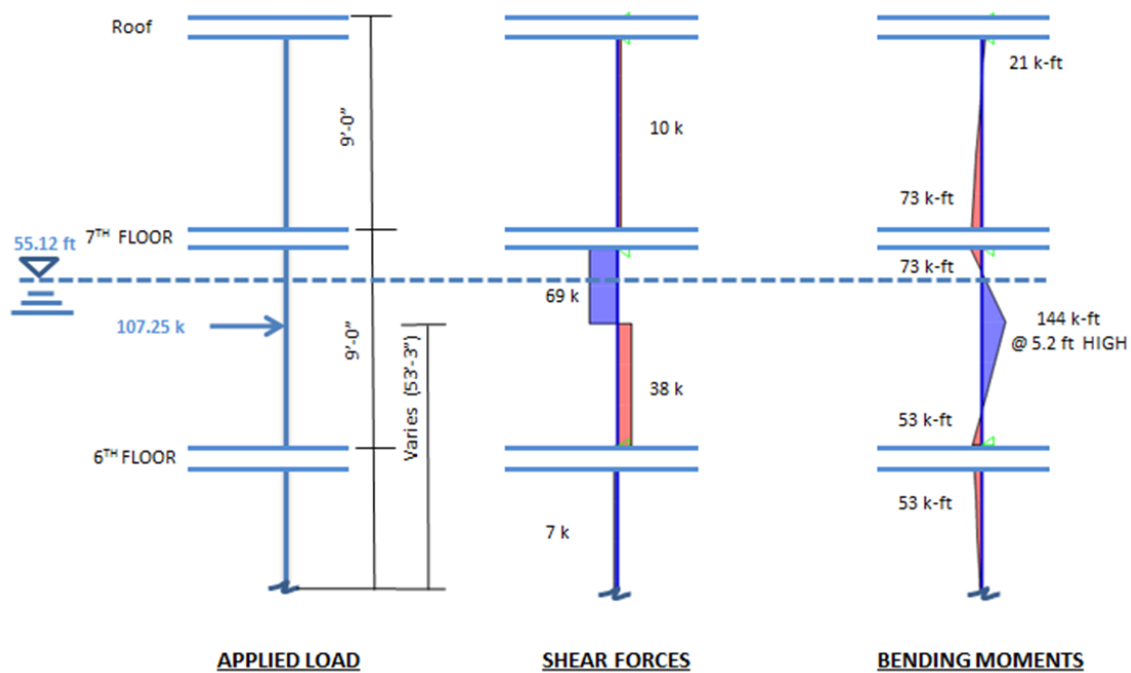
Impact load applied at "d + h_c" away from the end of column on the 6th floor
